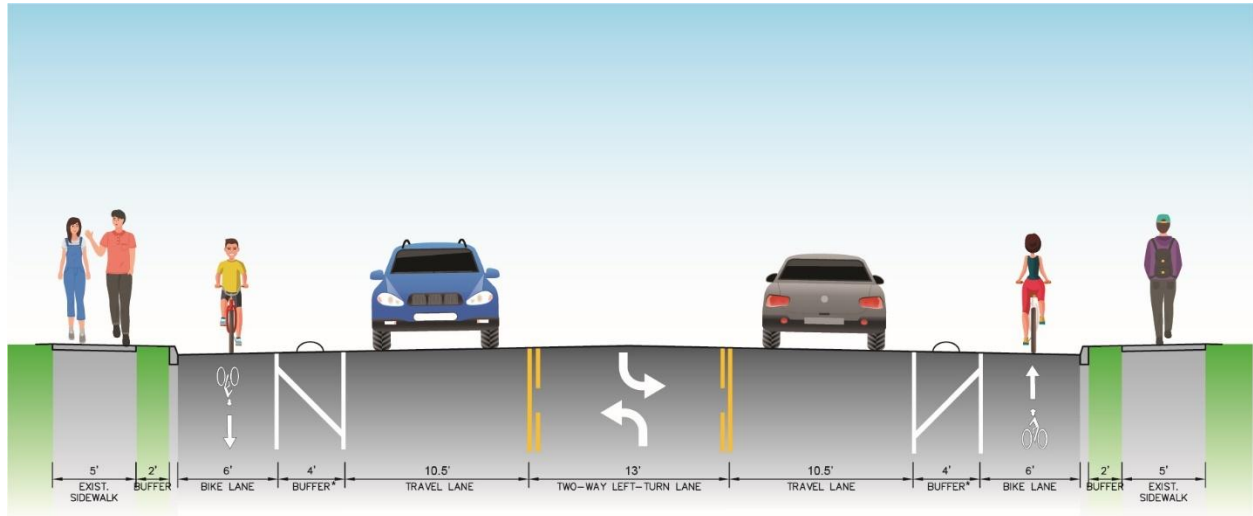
Alternative 2B: Directional Bike Lanes (64' Pavement Width)
